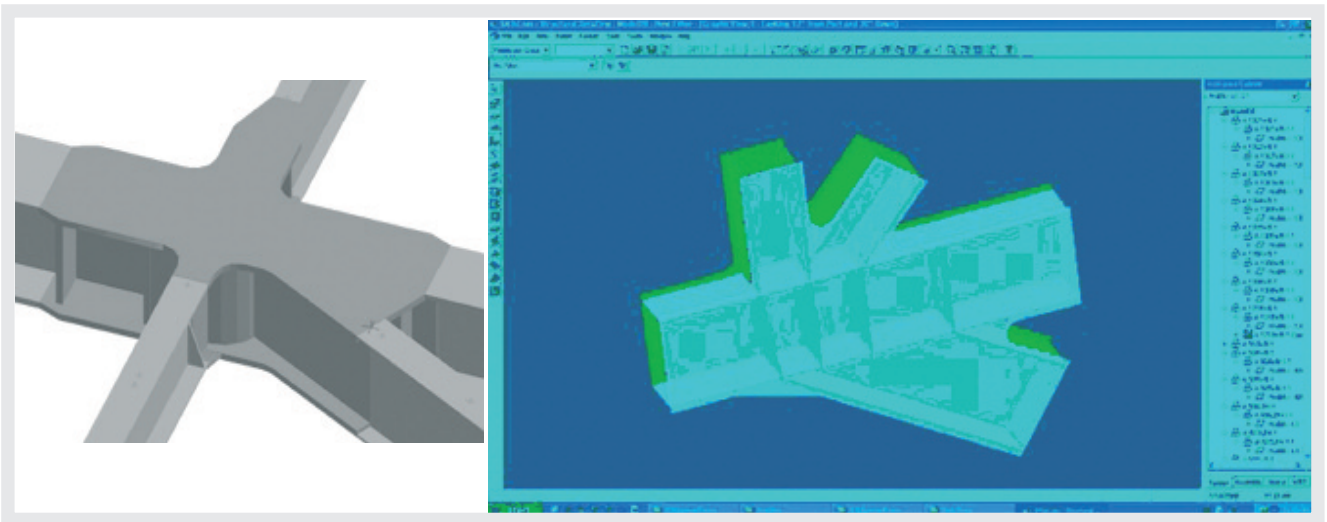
Typical nodal connections modeled with Geometric Construction
